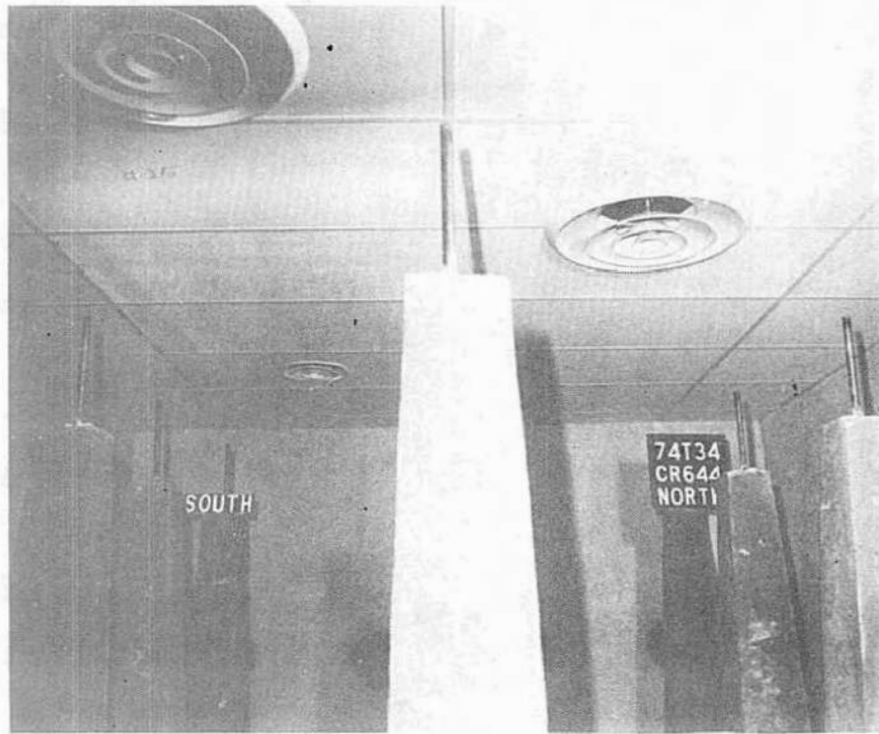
EXPOSED SURFACE BEFORE FIRE TEST, ASSEMBLY NO. 3
